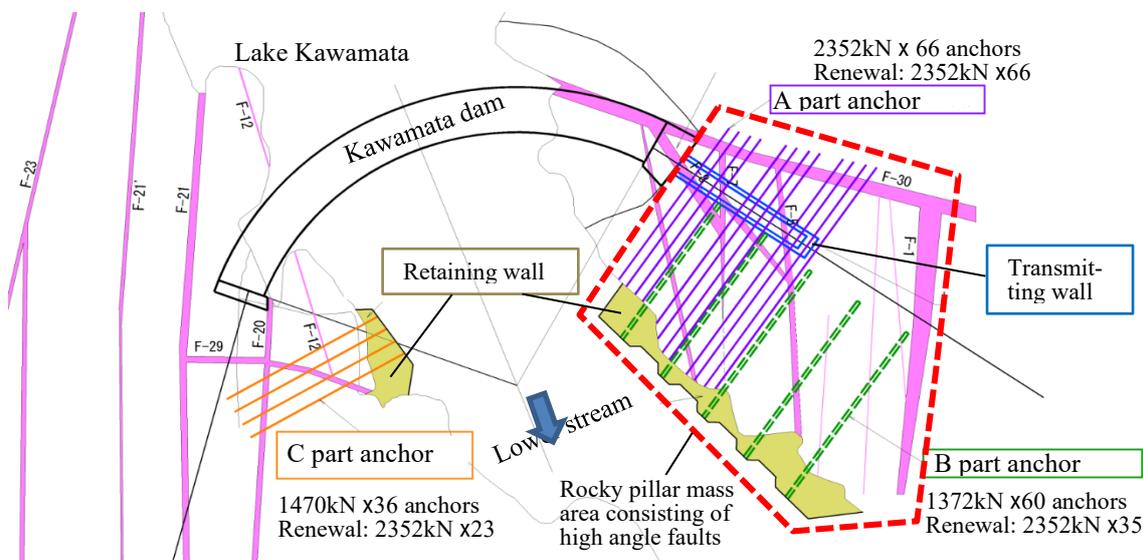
Plan of Kawamata Dam, transmitting wall and PS anchors in rock foundation
